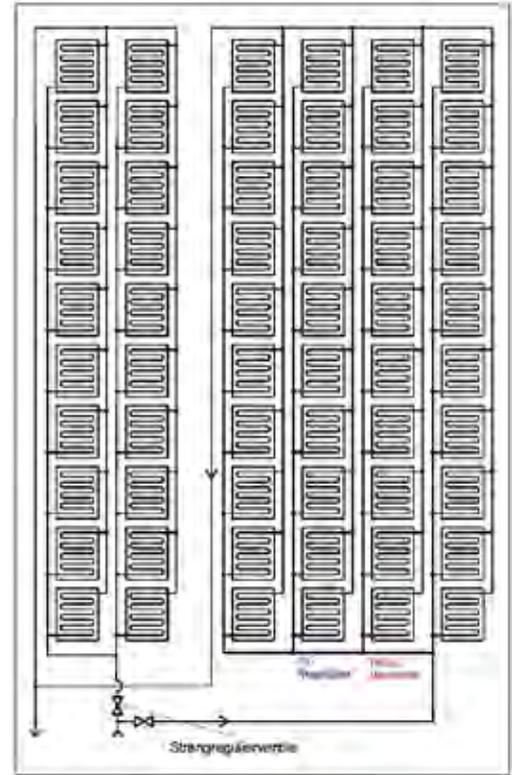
Piping schematic of the facade collector field (Apartment House Frankfurt).
